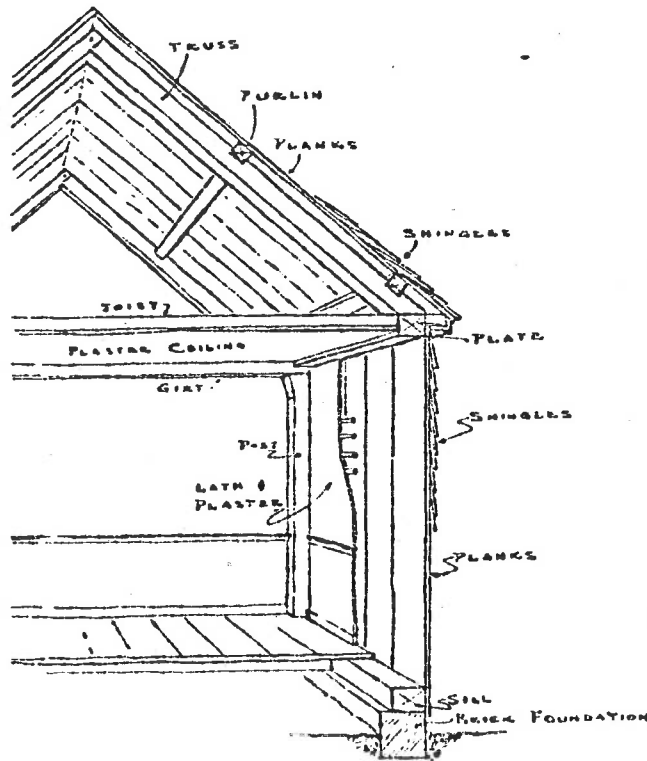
Sketch of typical plank construction observed in the traditional houses of Lower Cape Cod (author).
